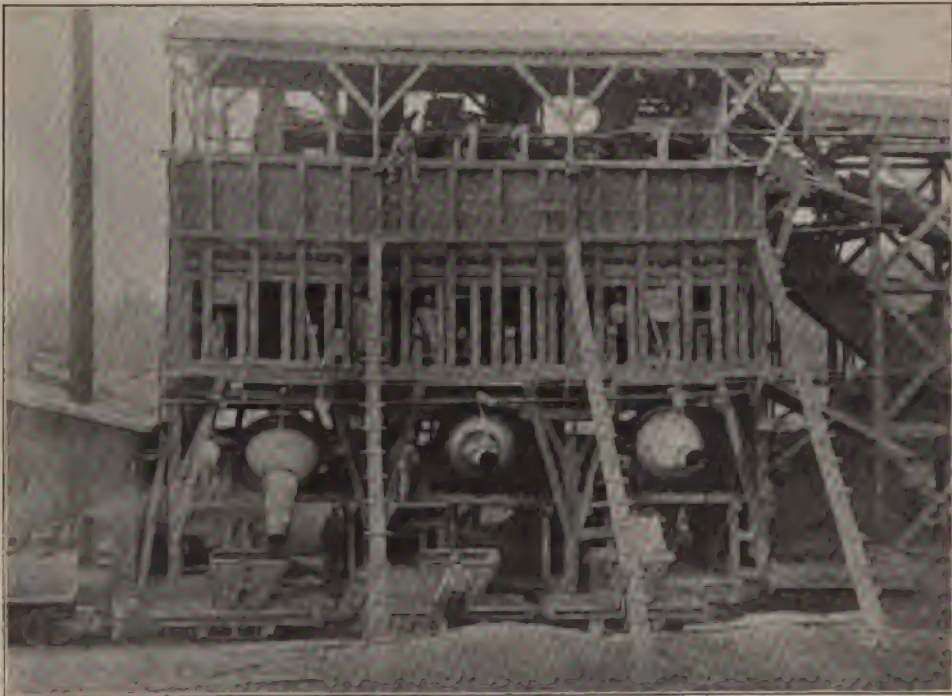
Installation employed for conveying and raising sand, cement and other material for concrete mixers at Washington filtration plant.
